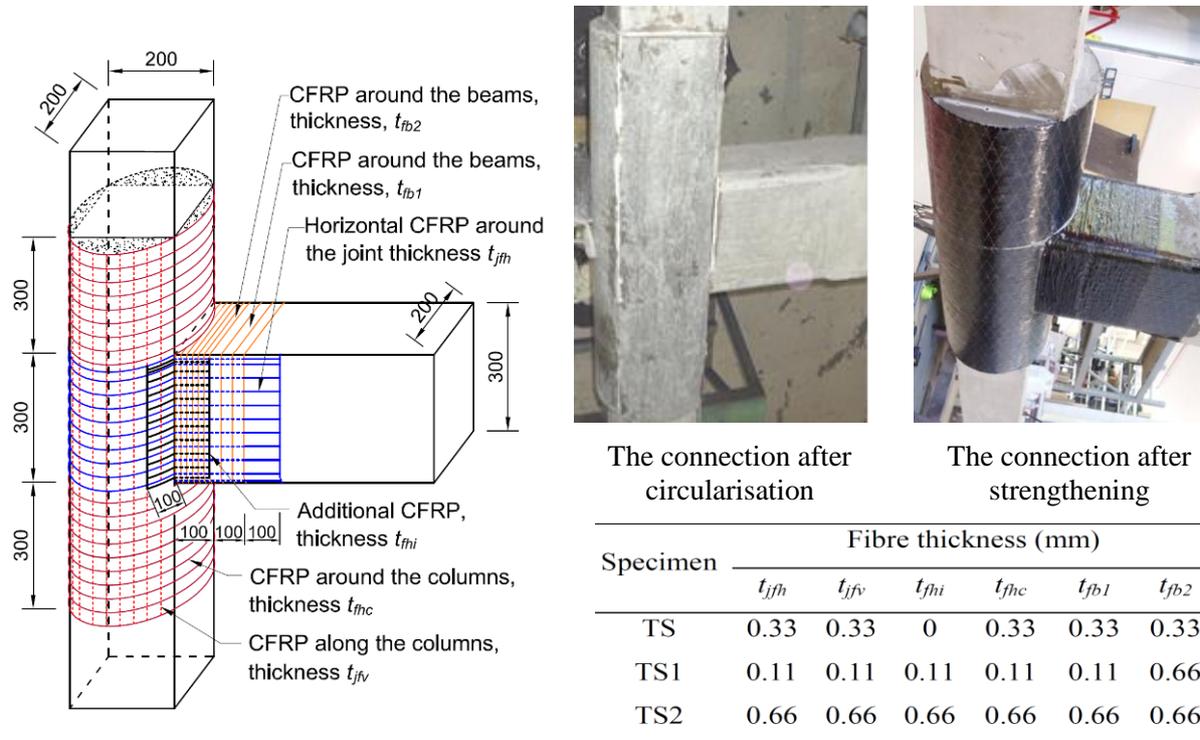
Reinforcement details of Specimens T0, TS, TS1 and TS2 (all dimensions in mm)
